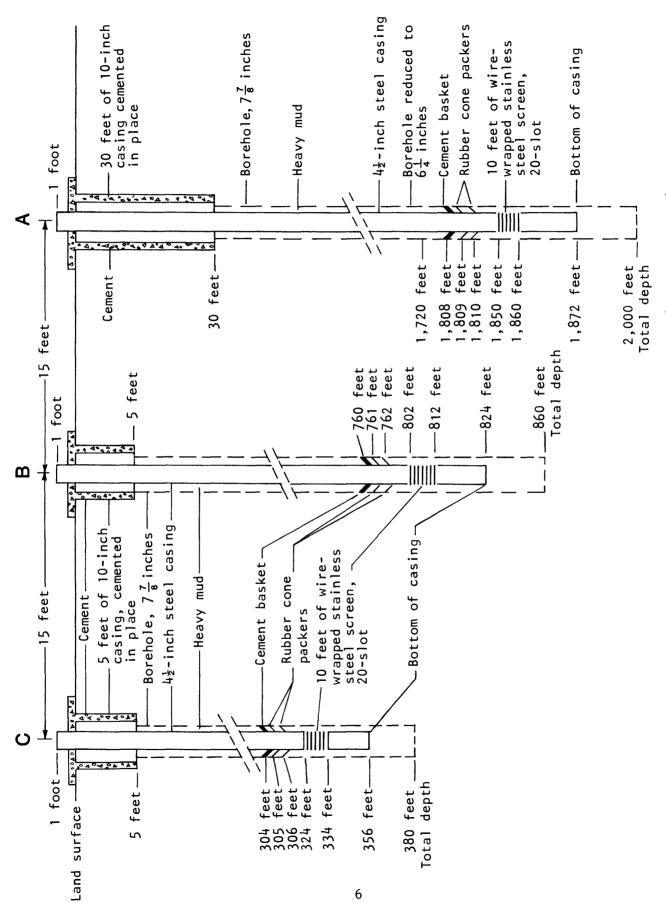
Construction details for well nest SF-2 (19N.07E.36.311).
